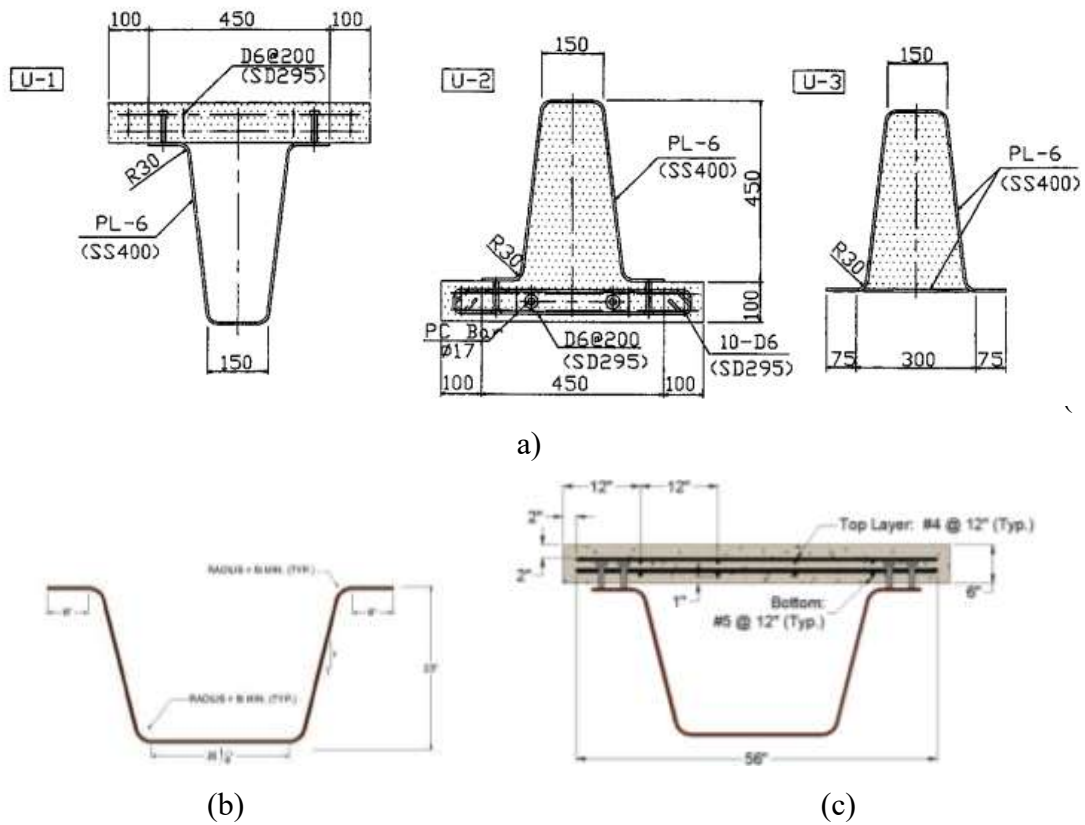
(a) Test samples by Nakamura (2002) [13], (b) non-composite press-brake-formed steel tub girder, [14], (c) Composite bridge girder of Michaelson (2015) [7]
